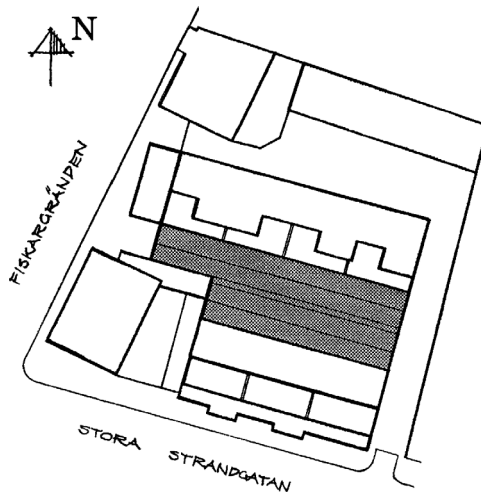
Layout plan, Tärnan (Wall, 1992a).
